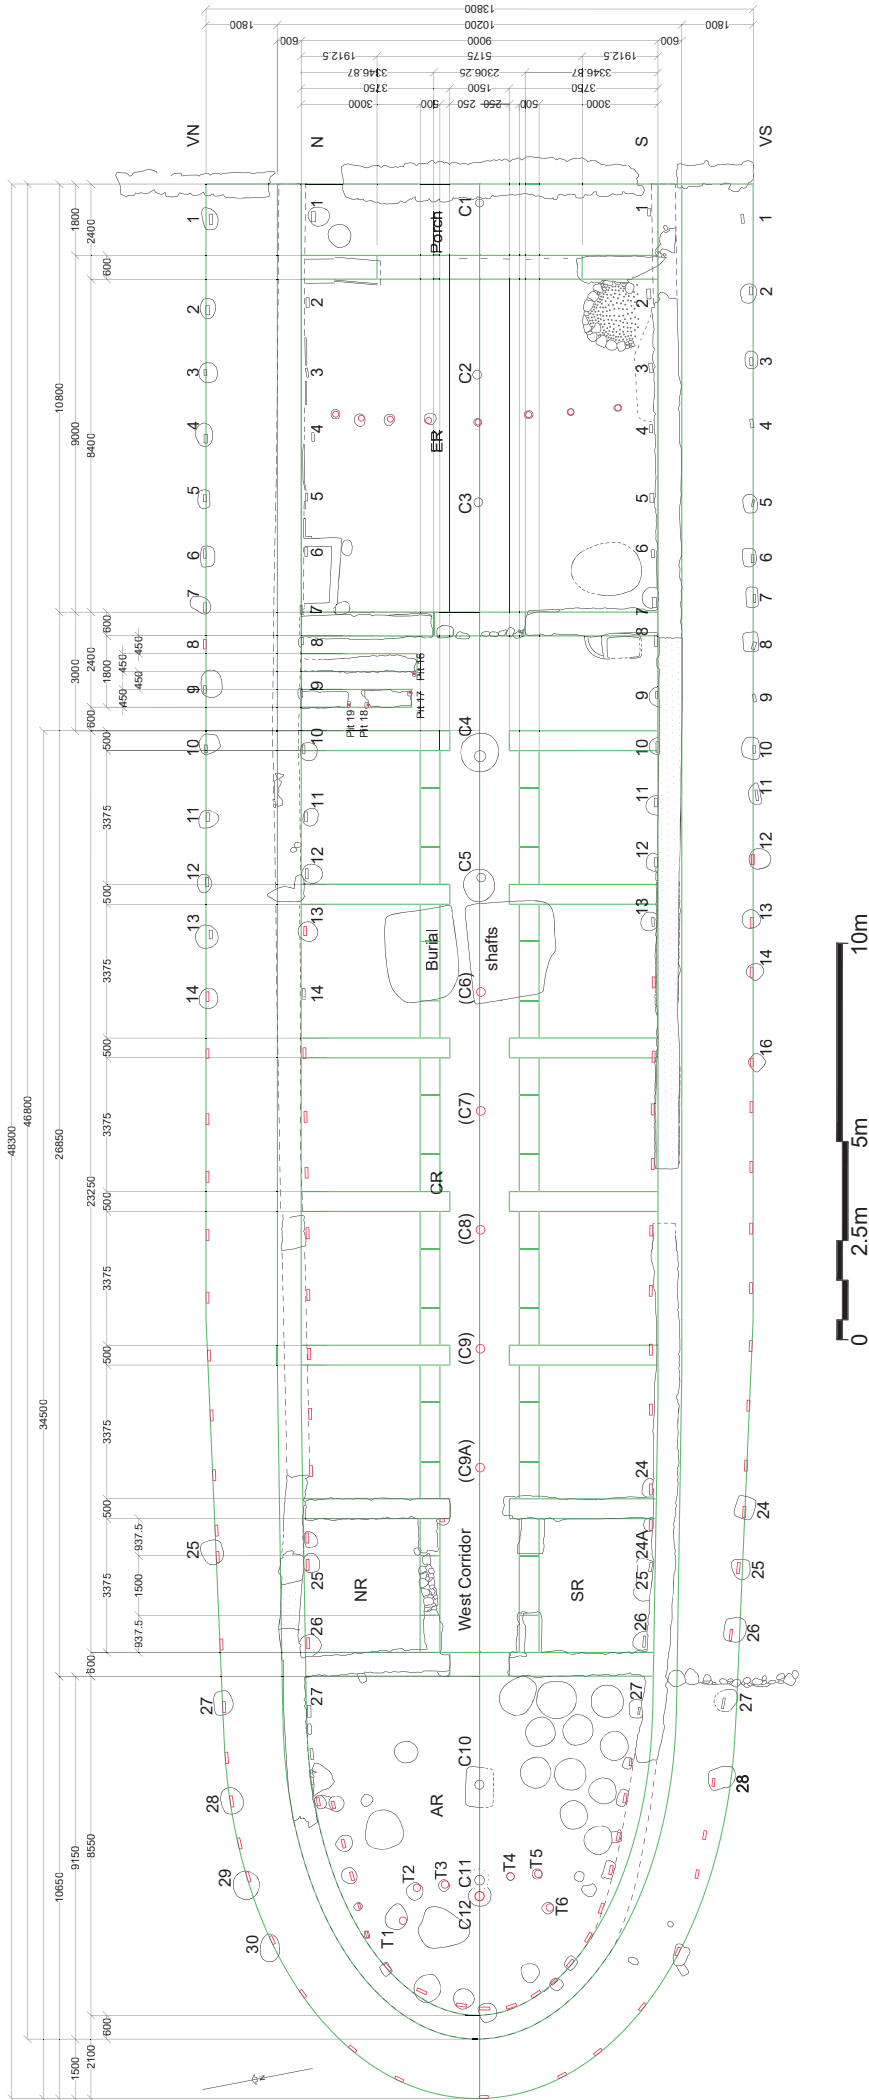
Reconstruction of the idealised plan of the LK-T building with two rows of antithetical rooms in the CR (in green) superimposed on the existing plan (in black).
